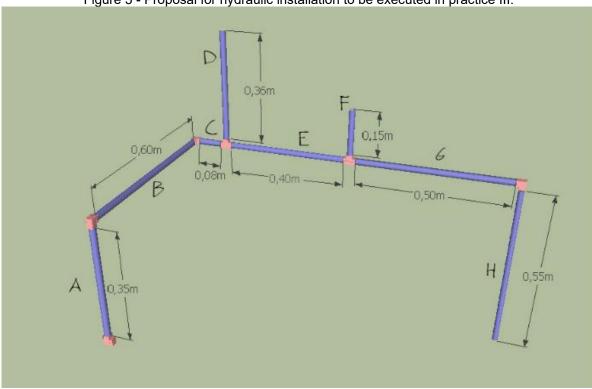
Proposal for hydraulic installation to be executed in practice III.
